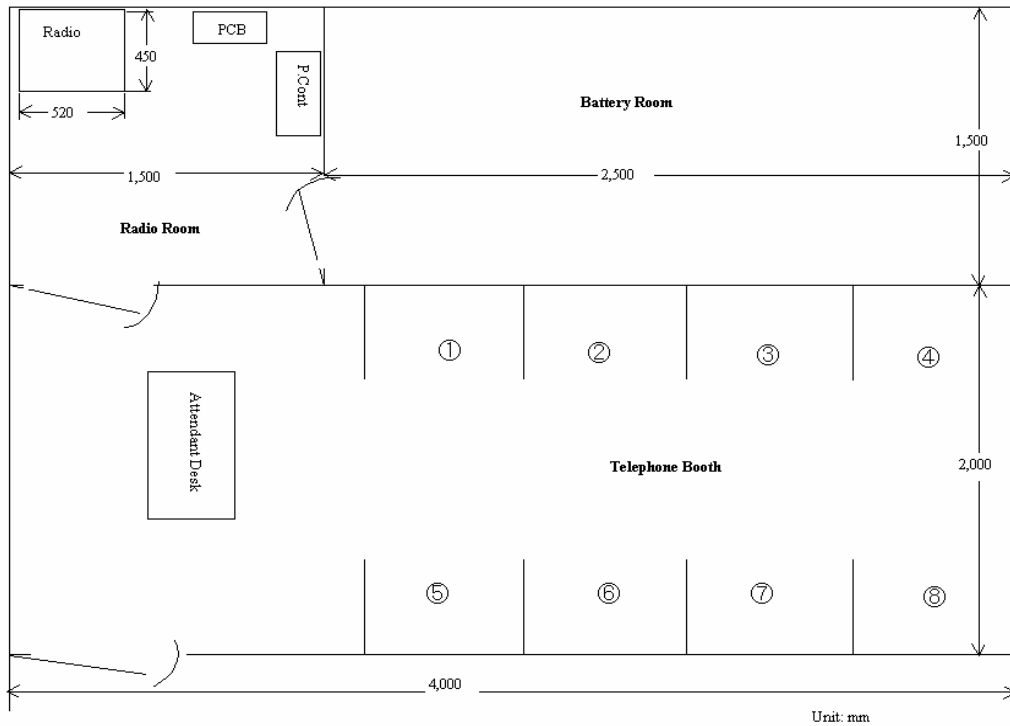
Typical Floor Layout Plan for PCO Subscriber Station (Reference)
